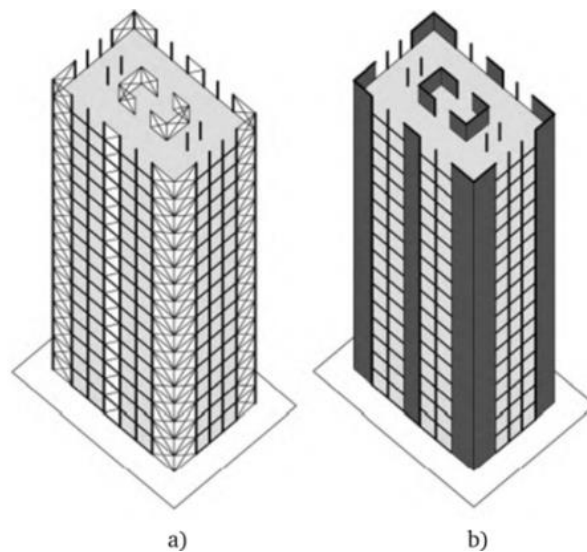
a) Steel truss b) Reinforced concrete shear wall [4]
